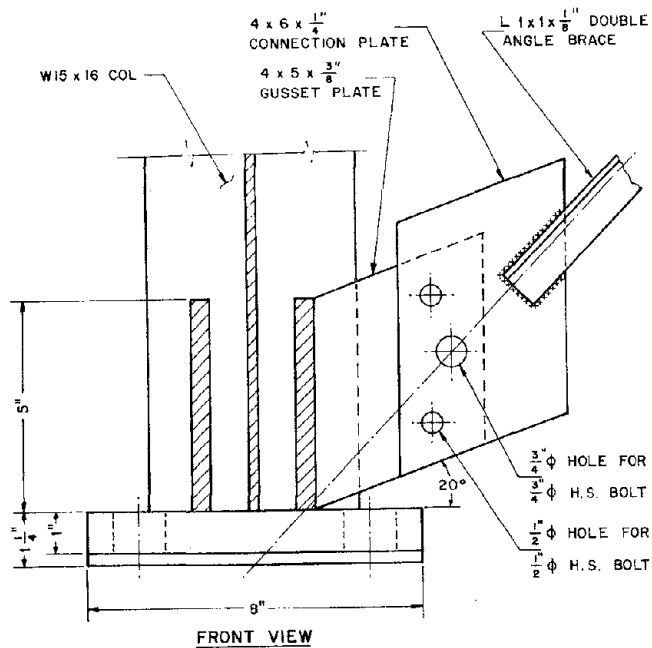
Details of Cross Beam-to-Column Connection
